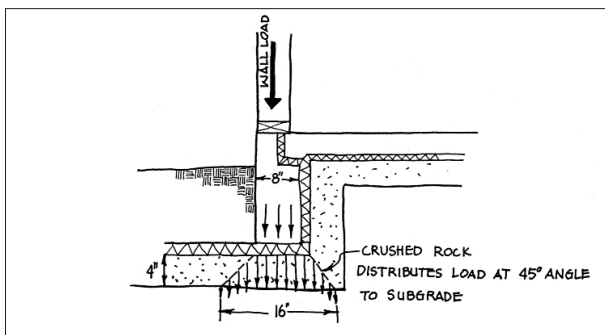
An 8-inch foundation wall, bearing on insulation and gravel, distributes the house load over the same subsoil area as a 16-inch spread footing.
